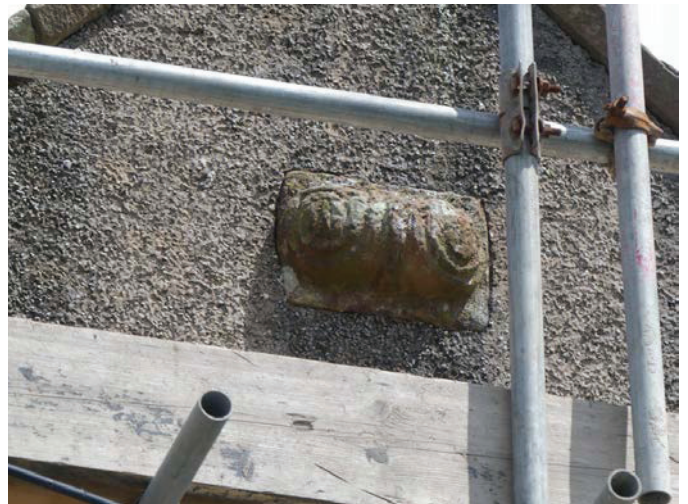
(right): The decorated stone in the south-west external elevation, viewed from the south-west
